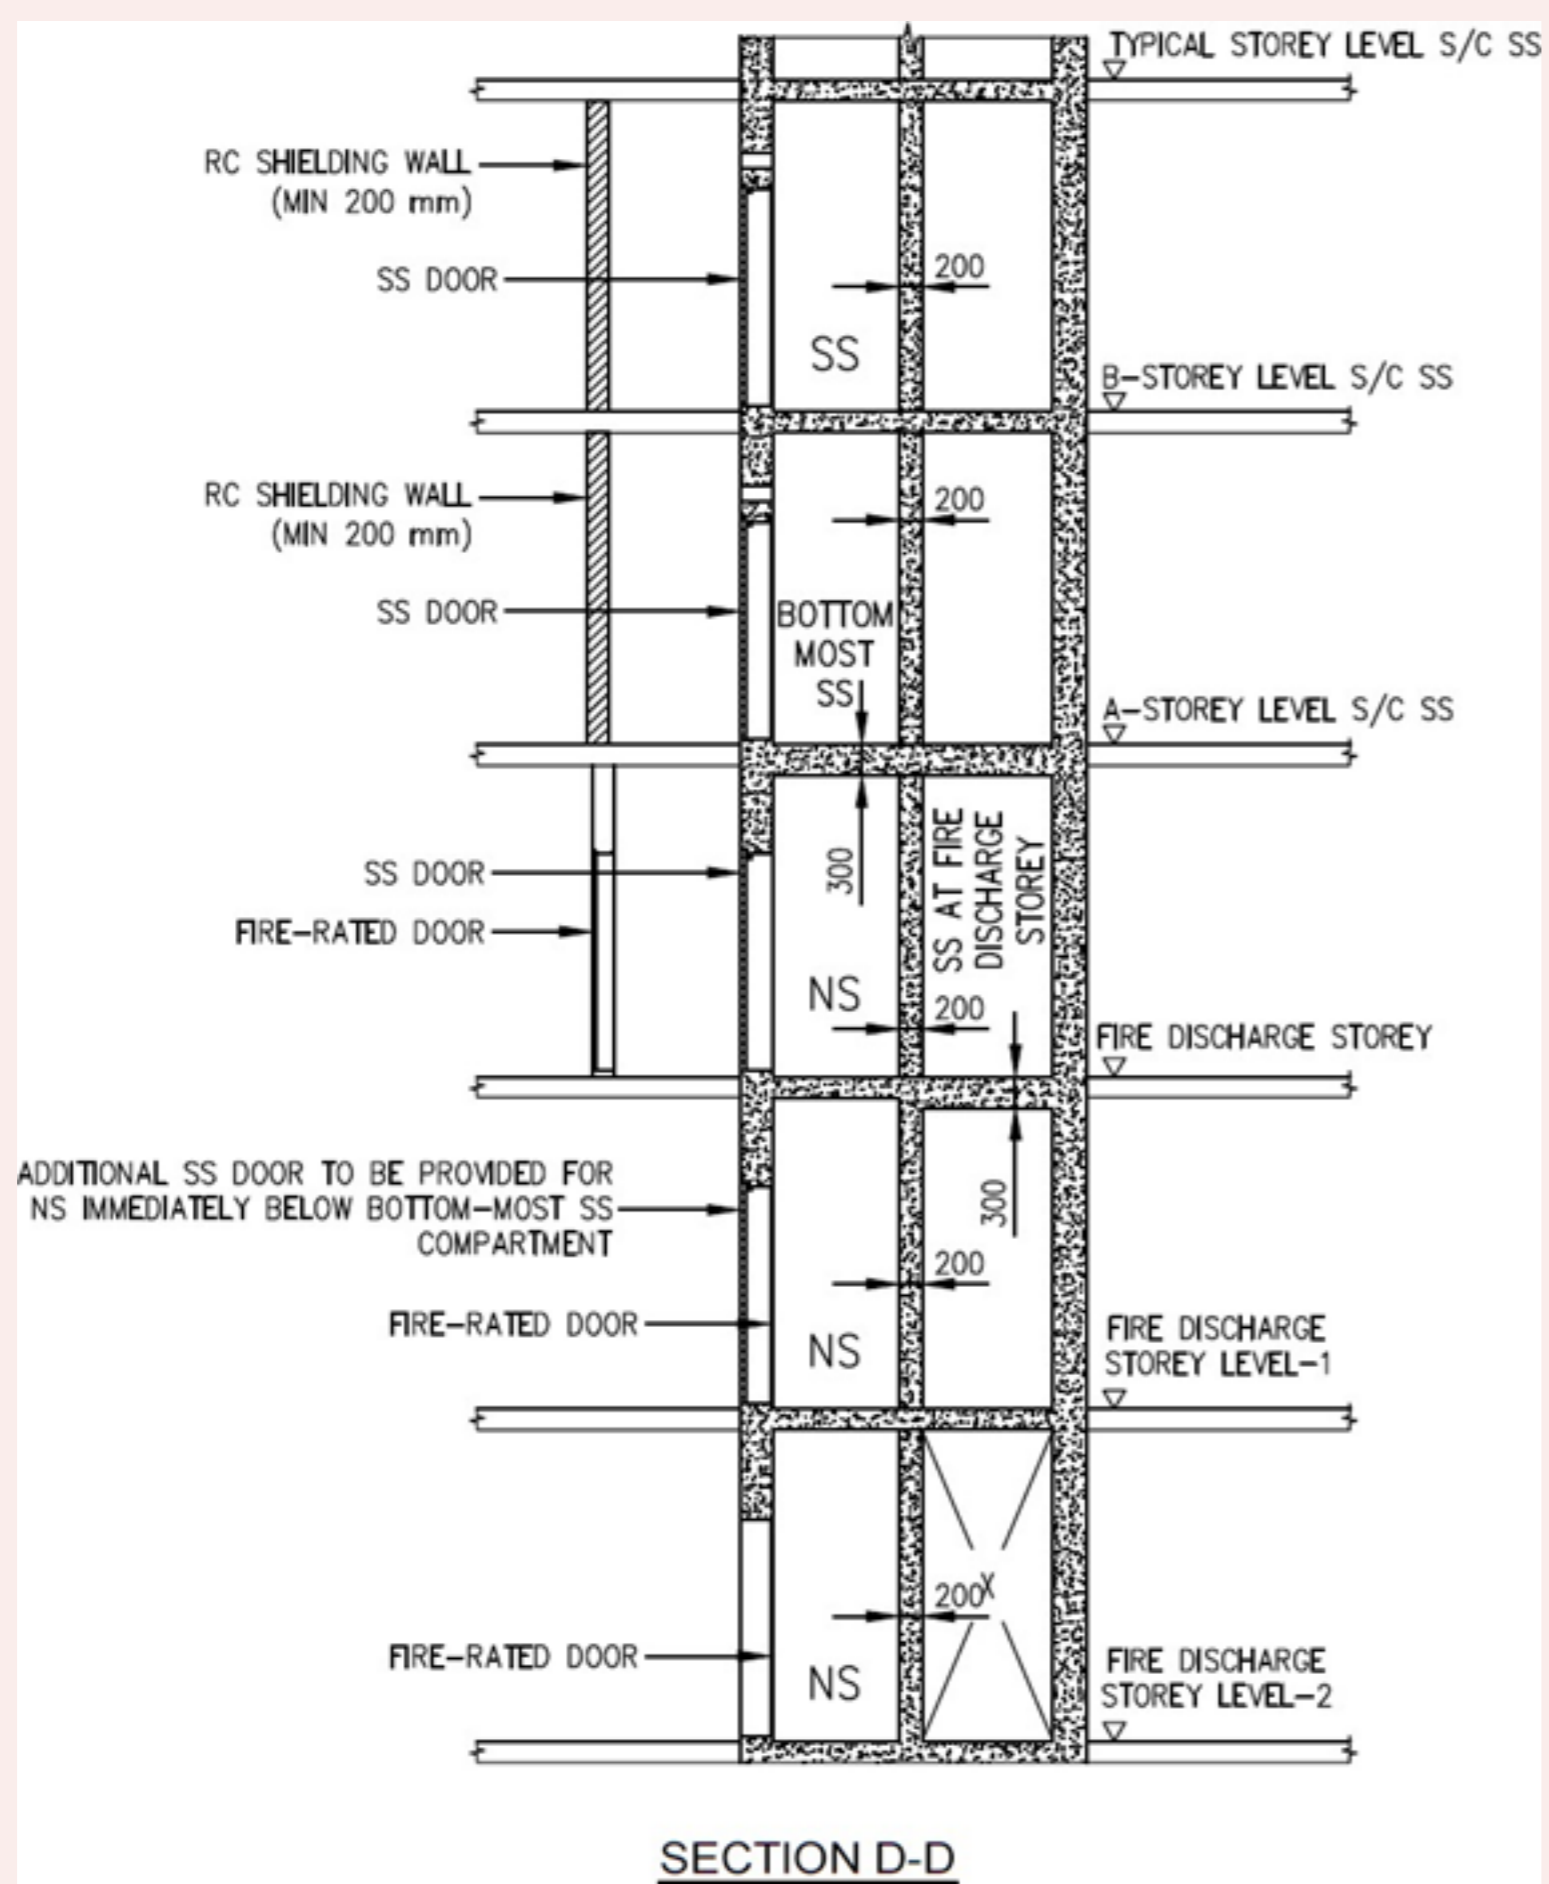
(h): DETAIL SECTION OF SS AND NS AT FIRE DISCHARGE STOREY
